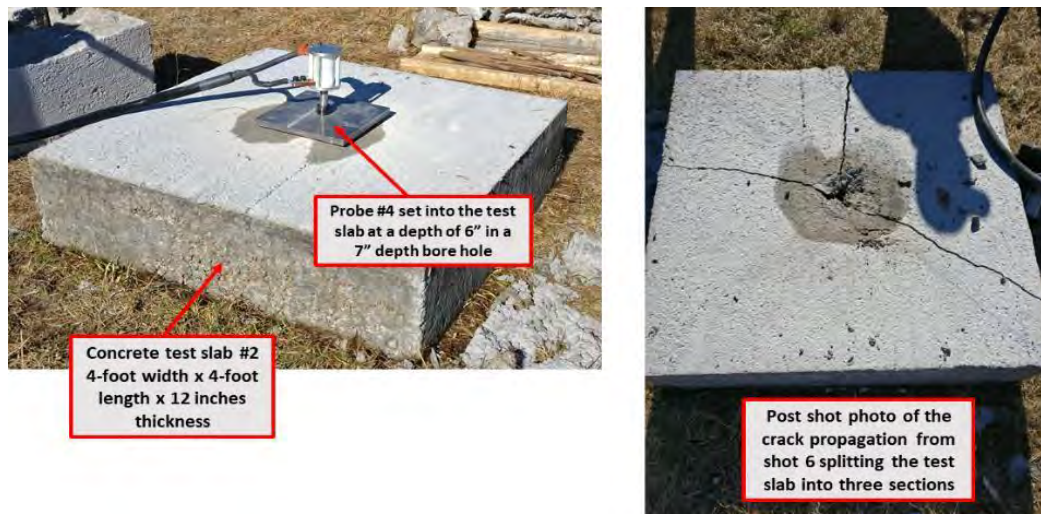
Crack Propagation in Concrete Test Slab 2 from Shot 6
